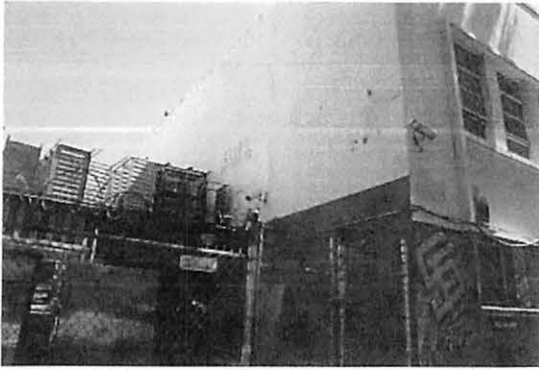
North facade, front two-story section with parking structure attached, facing southeast.
